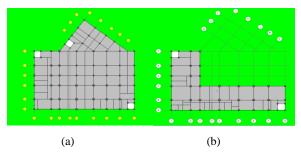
Plan for beam-column system: (a) GF to 3^{rd} floor & (b) 5^{th} floor to roof
